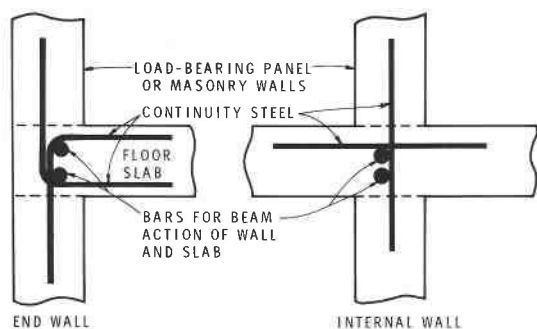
Schematic detail of ductile joints showing continuity and longitudinal tying steel, diagrammatic only (see commentary C, supplement No. 4, 1975 NBC).
